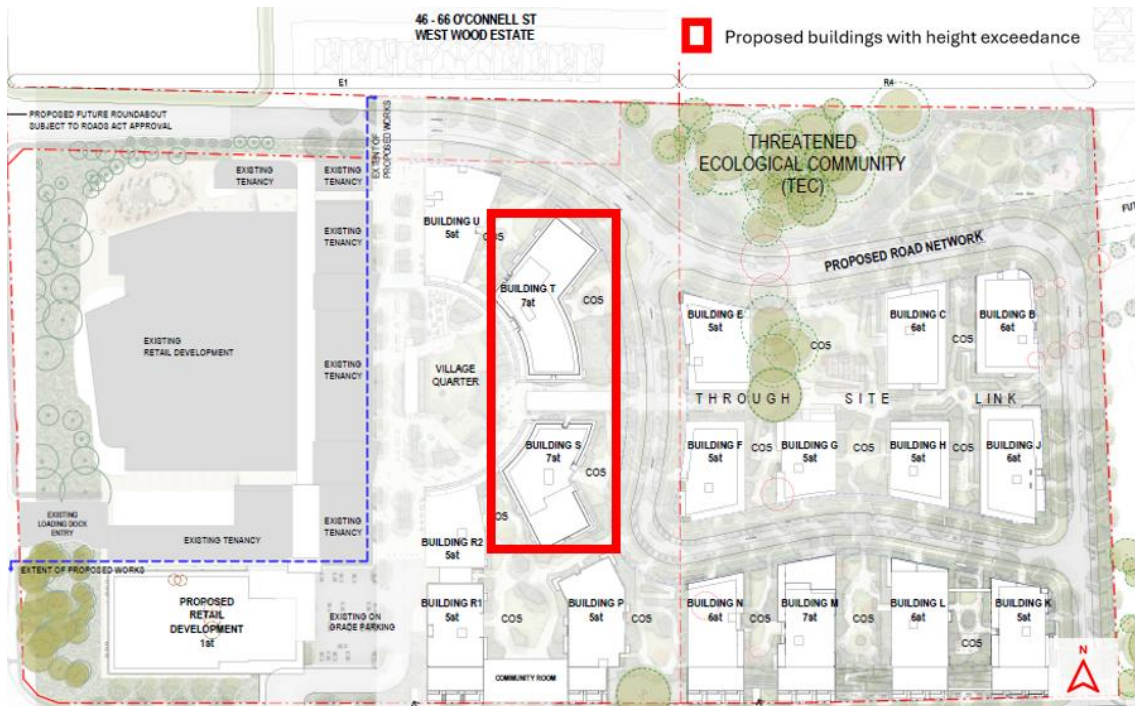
Site Plan illustrating Buildings S and T in red (Source: Group GSA)
